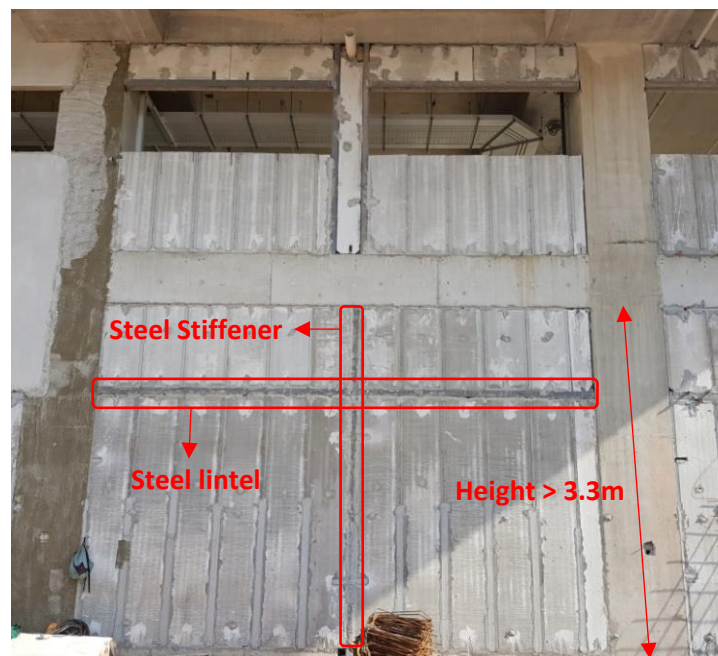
Erected precast hollow concrete wall with steel stiffeners and lintels
